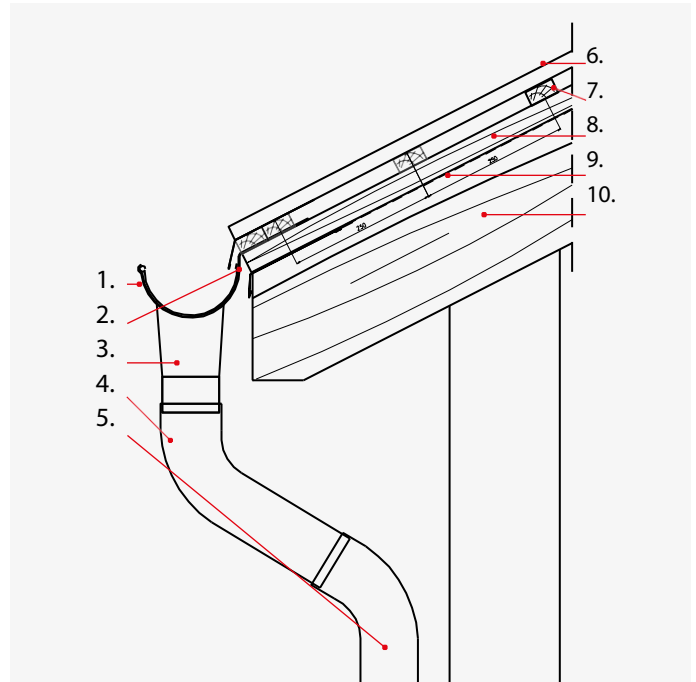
ROOF CROSS-SECTION ACROSS THE EAVES
